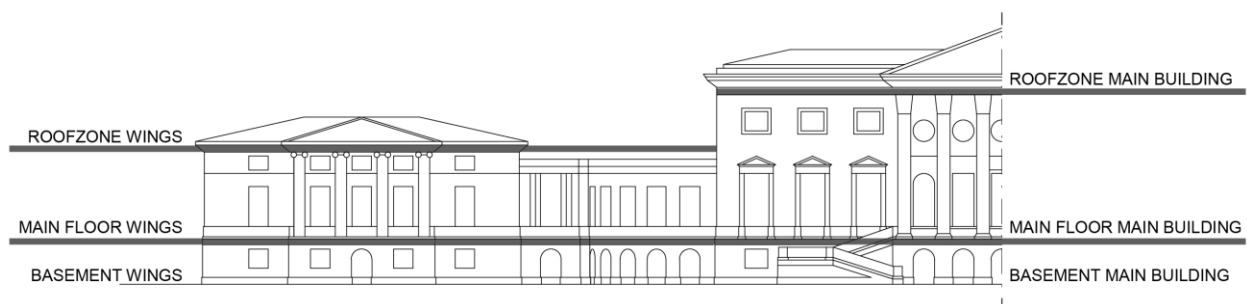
The different layer structures of the north façade of the main building and the wings of Kedleston Hall
